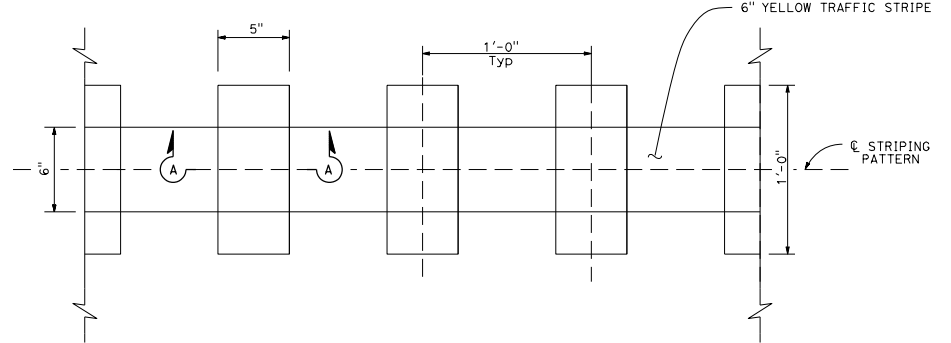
and Detail 5 traffic stripes shown, see project plans for traffic stripe details.
